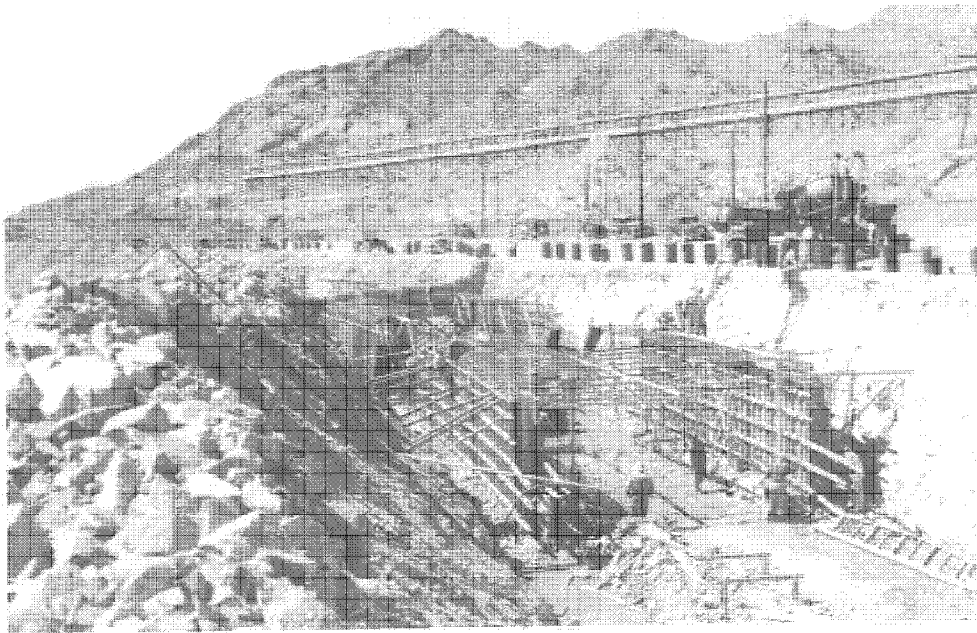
Pouring First Concrete, Closed Conduit "B," 22 June 1937.
